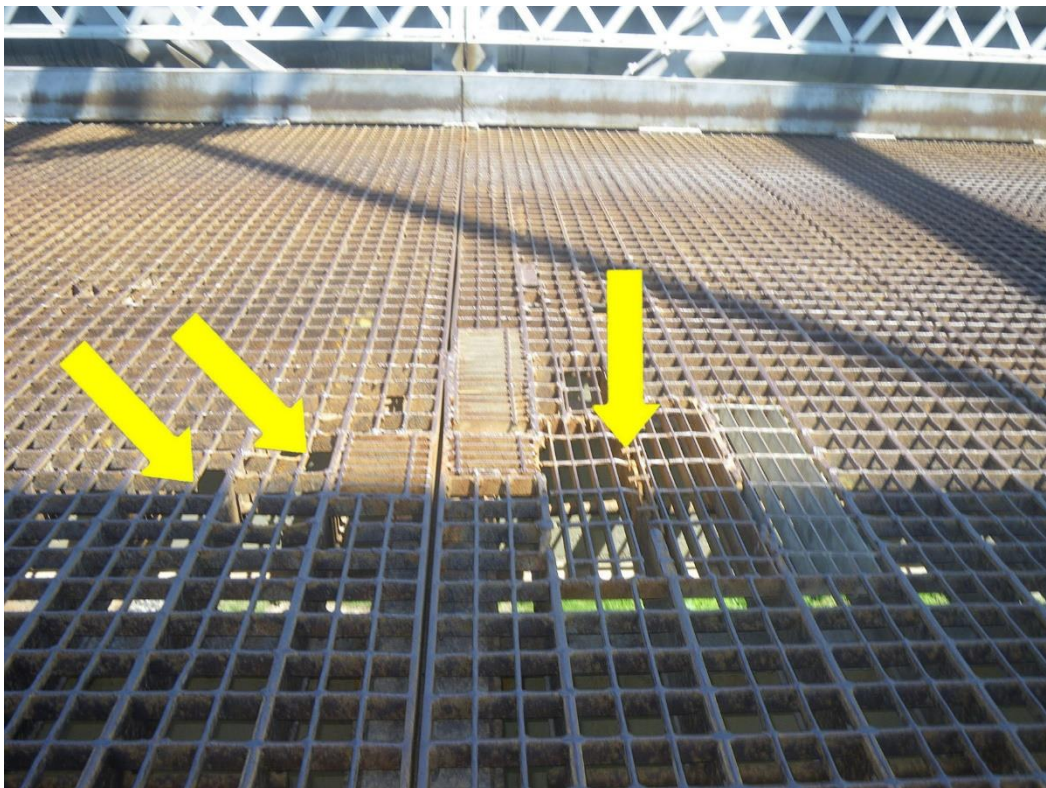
Deck between Stringers S4 and S9, at Floorbeam FB4N, Span 1, Looking East - Area of repairs and missing longitudinal and transverse distribution bars. Note one repair with sharp edges.
